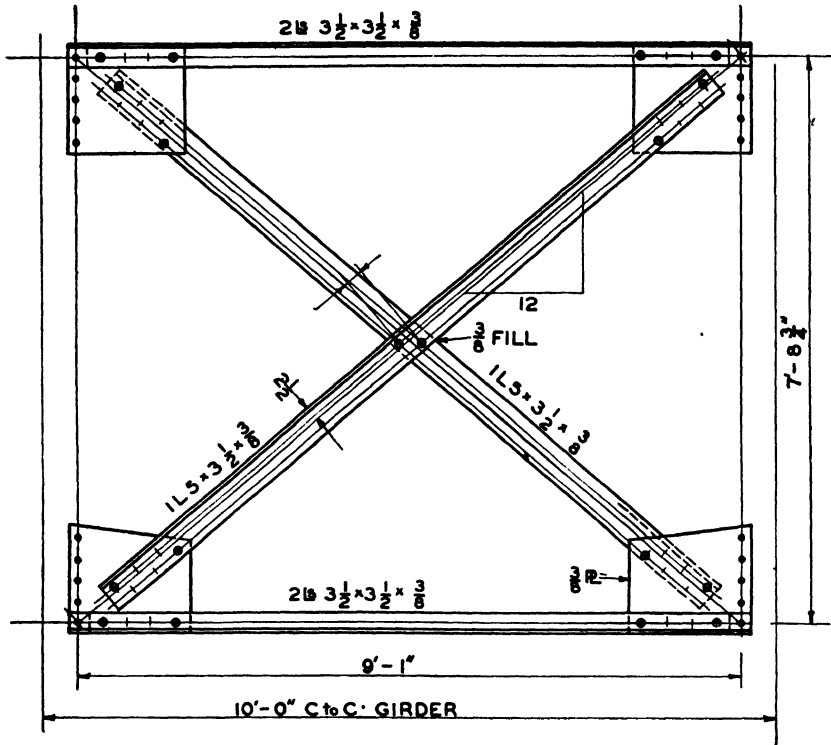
Layout of interior cross-frame for 100-ft. railroad deck girder span.
